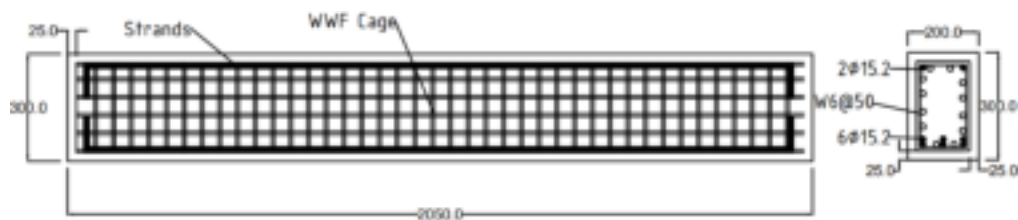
Sample beam detailing containing WWF (W-6-50-2.5-35).
